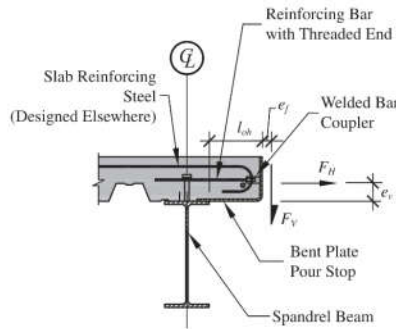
Section of slab edge with bent plate as pour stop with welded bar coupler.
